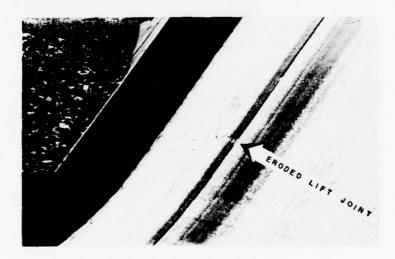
Spillway looking toward right abutment showing poor lift joint in monolith 9
